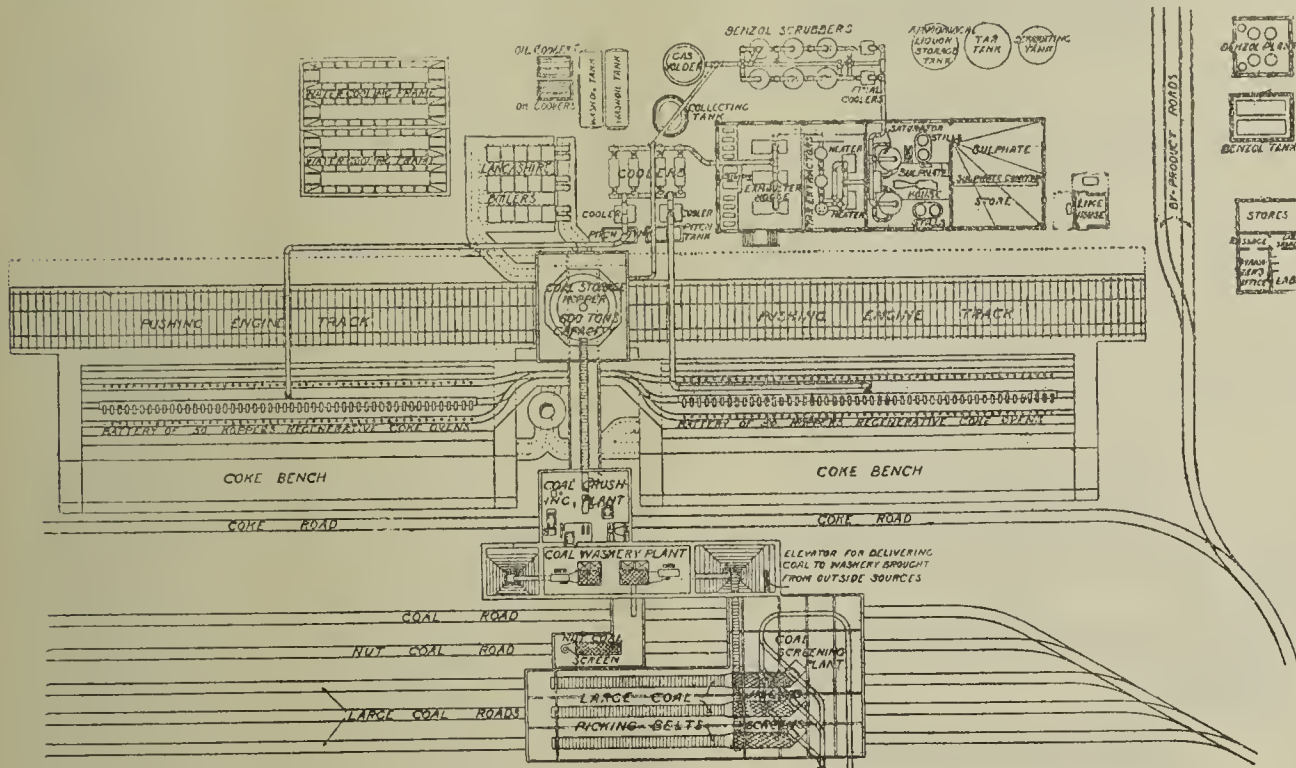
GENERAL ARRANGEMENT OF A COMPLETE MODERN COKING PLANT.
